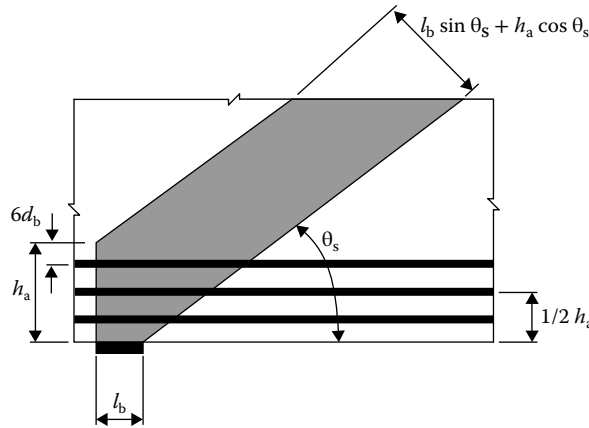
Strut anchored by bearing and reinforcement.
